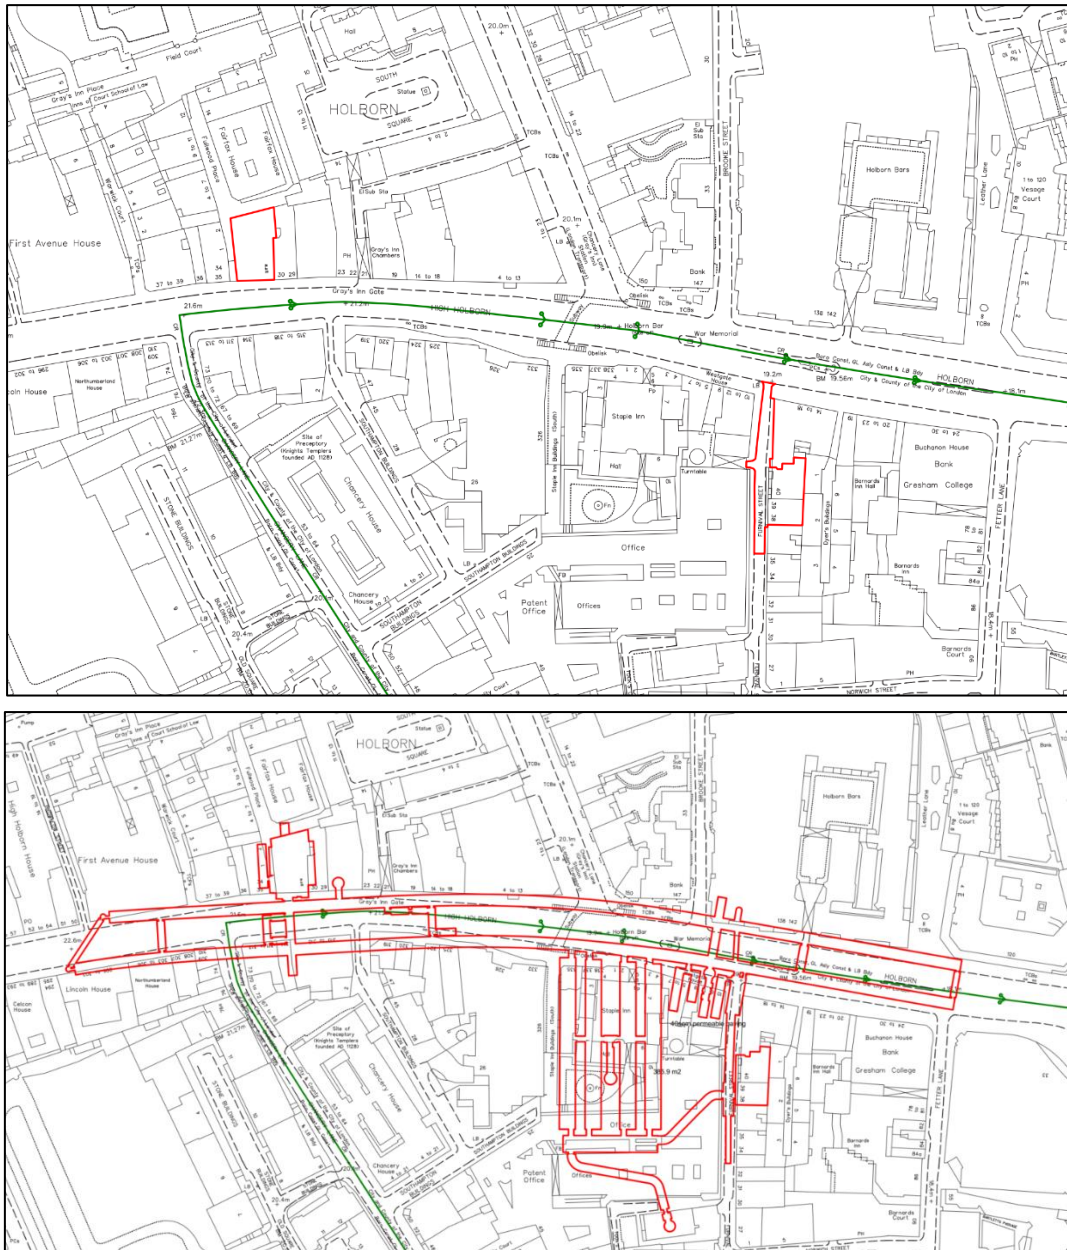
Extract from Site Location Plans (Site Location Plan 1 - Above Ground, Site Location Plan 2 - Below Ground)
